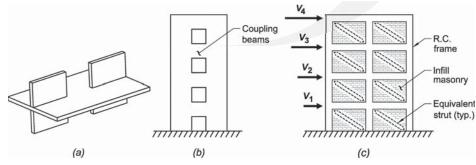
Coupled and infill walls: (a) shallow coupling beams or slabs; (b) coupling beams; and (c) infill walls.
